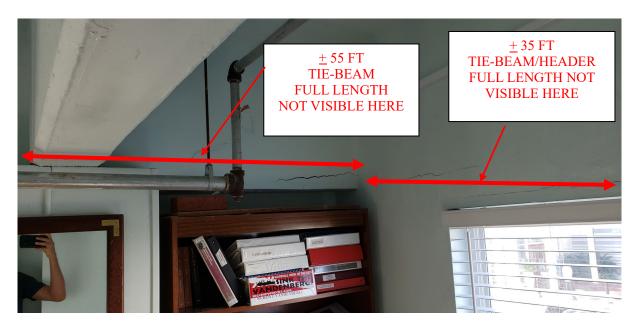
A. Interior corner view. Location 34: Approximately 55 ft long new 12x24 horizontal tie-beam. See detail 3/S103. Approximately 35 ft long new 8x24 horizontal tie-beam/header. See detail 10/S106.
